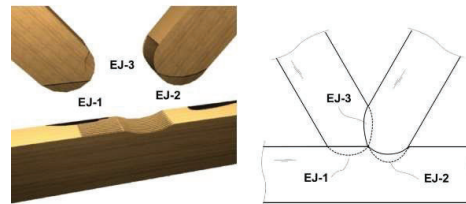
Glued truss joint, US7975736, suitable for light and robust trusses.
